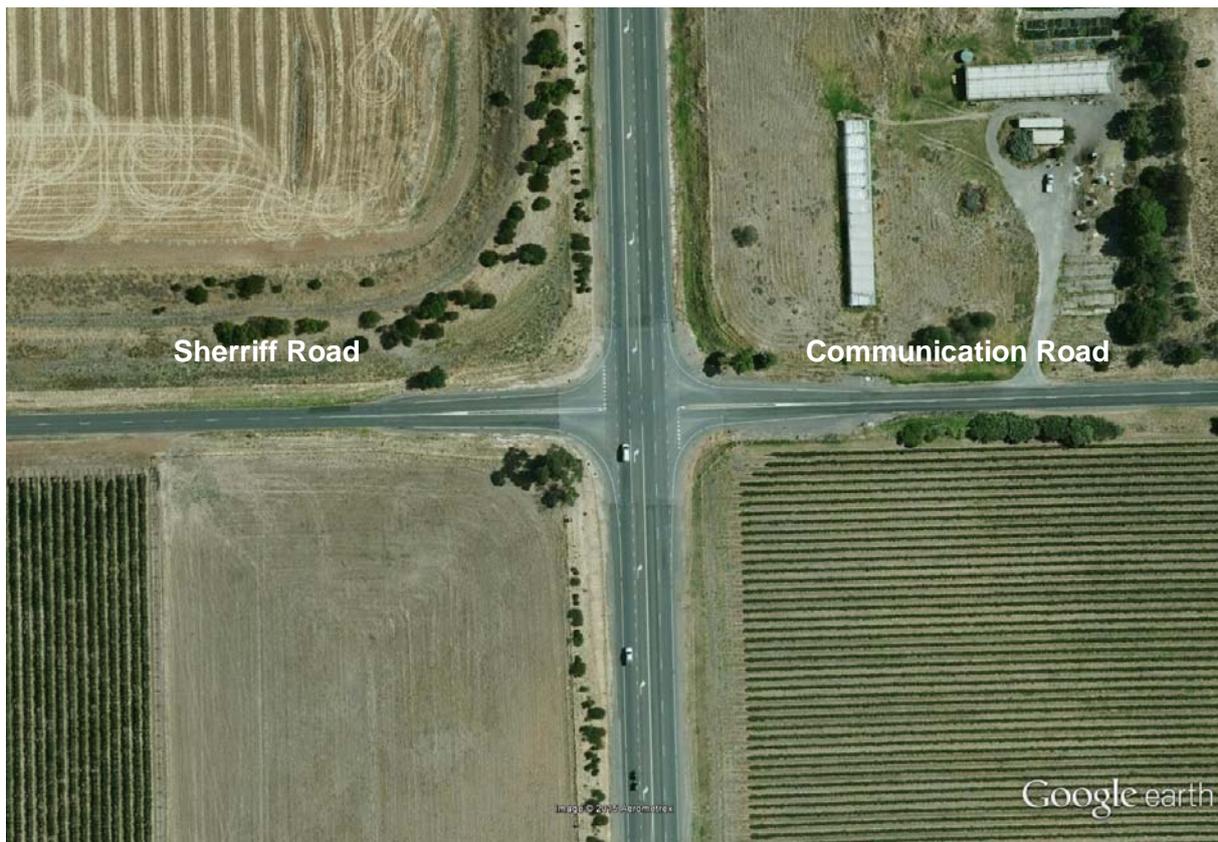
Existing Layout of Main South Road / Sherriff Road / Communication Road Intersection
